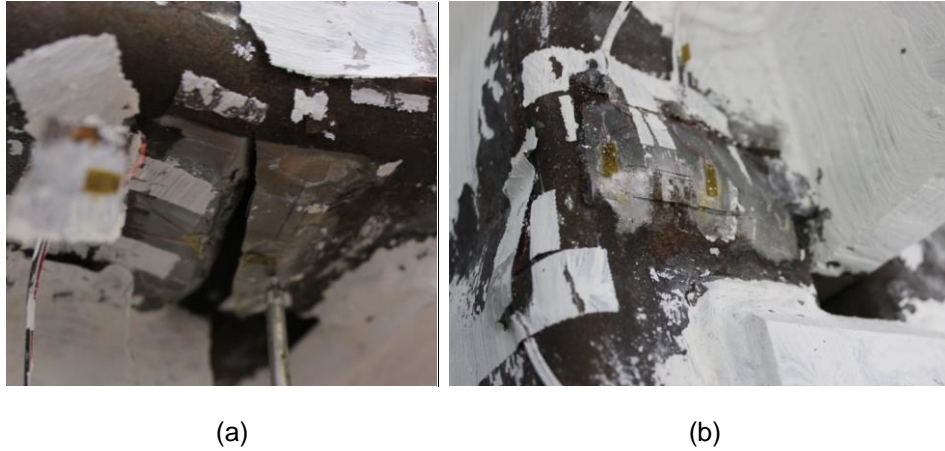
(a) Crack propagation in tension flange and (b) flange buckling in compression flange
